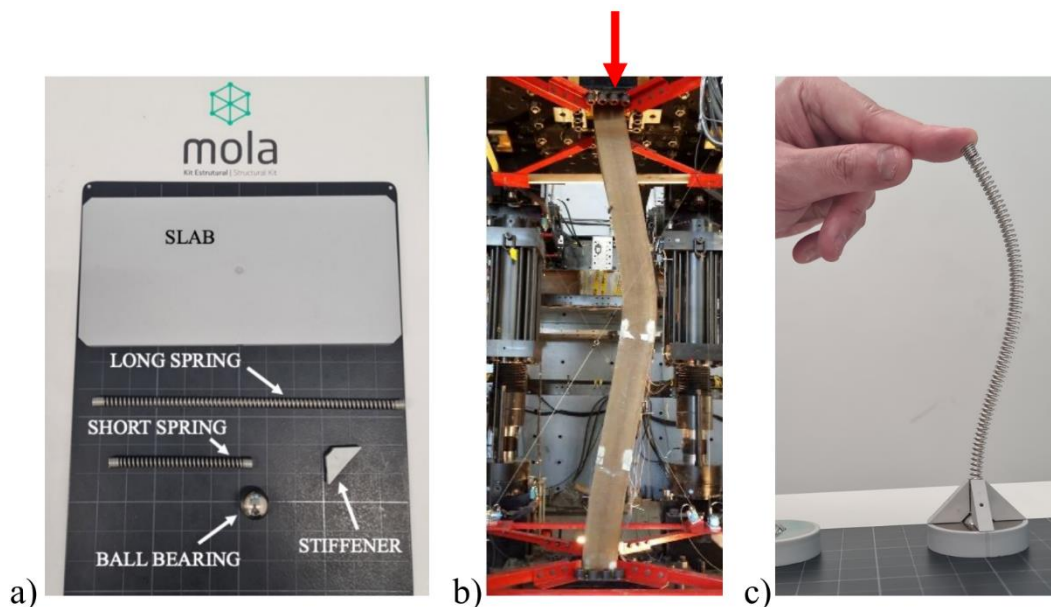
Global buckling of a steel column under vertical load: a) building blocks of the MOLA (“Mola Structural Model: A New Way to Learn About Structures,” n.d.) structural activity kit, b) laboratory experiment (image courtesy of Prof. Robert Tremblay, École Polytechnique Montréal), c) small-scale model demonstration of buckling using the activity kit.
